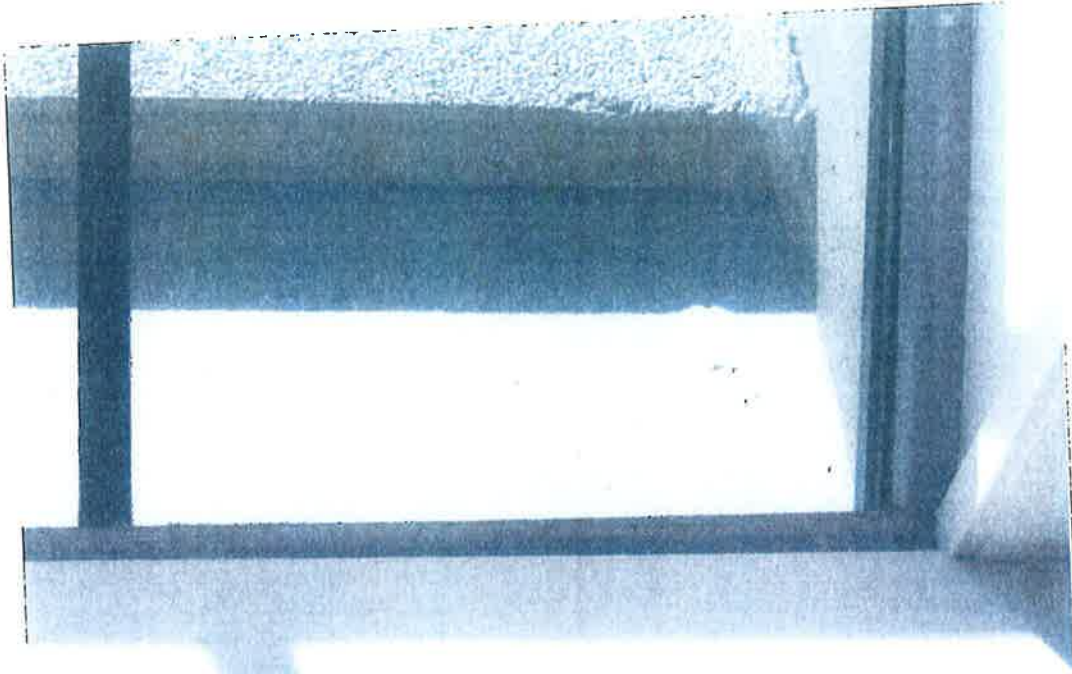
Cracking in first floor beam north elevation over entry.
